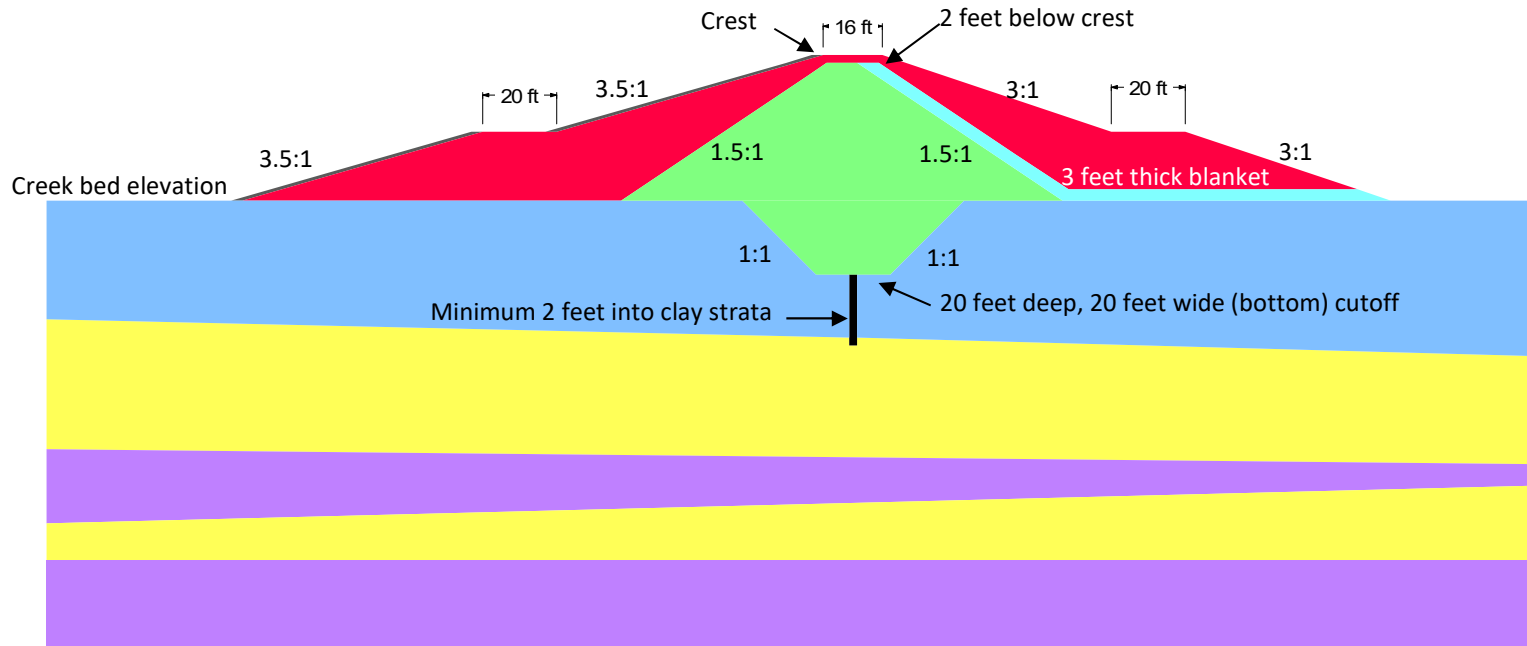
Alternative 2 Typical Section Used in Slope Stability Analysis
